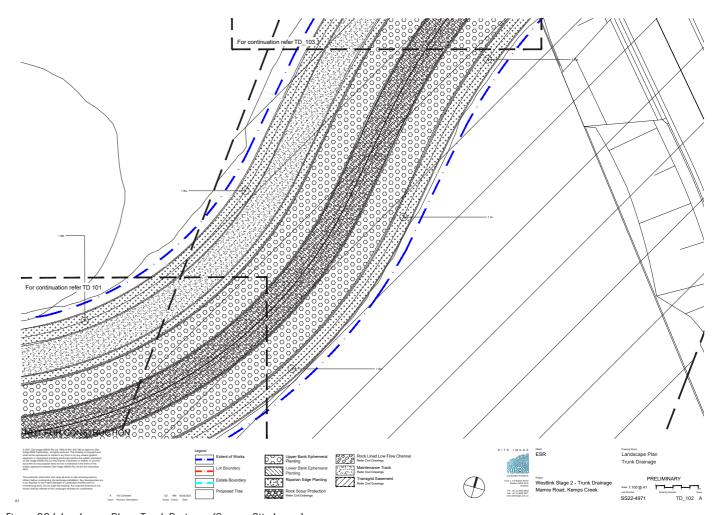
Landscape Plan - Trunk Drainage (Source: Site Image)
